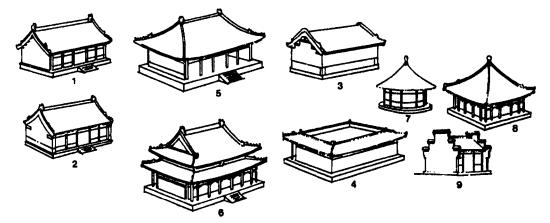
Roof types of Chinese traditional architecture: 1: Xuanshan roof; 2: Yingshan roof; 3: Juanpeng roof (minority); 4: Luding roof (minority); 5: Wudian roof; 6: Double-eave Xueshan roof; 7 & 8: Cuanjian roof; 9: Gable roof with parapet wall (Liu, 1989, p32)
